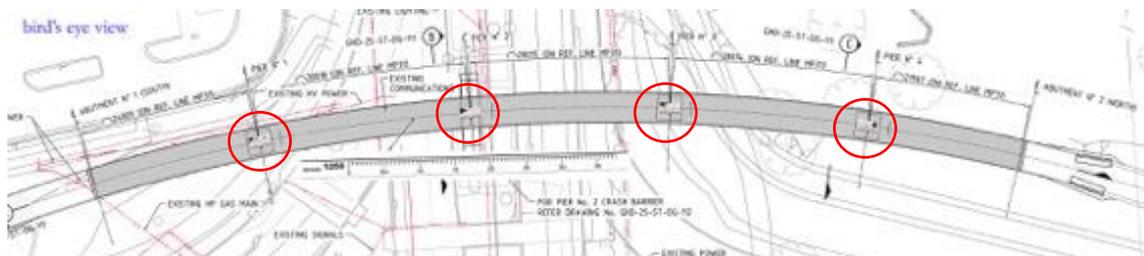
Artwork site location across Burns Beach Road Pedestrian Bridge
